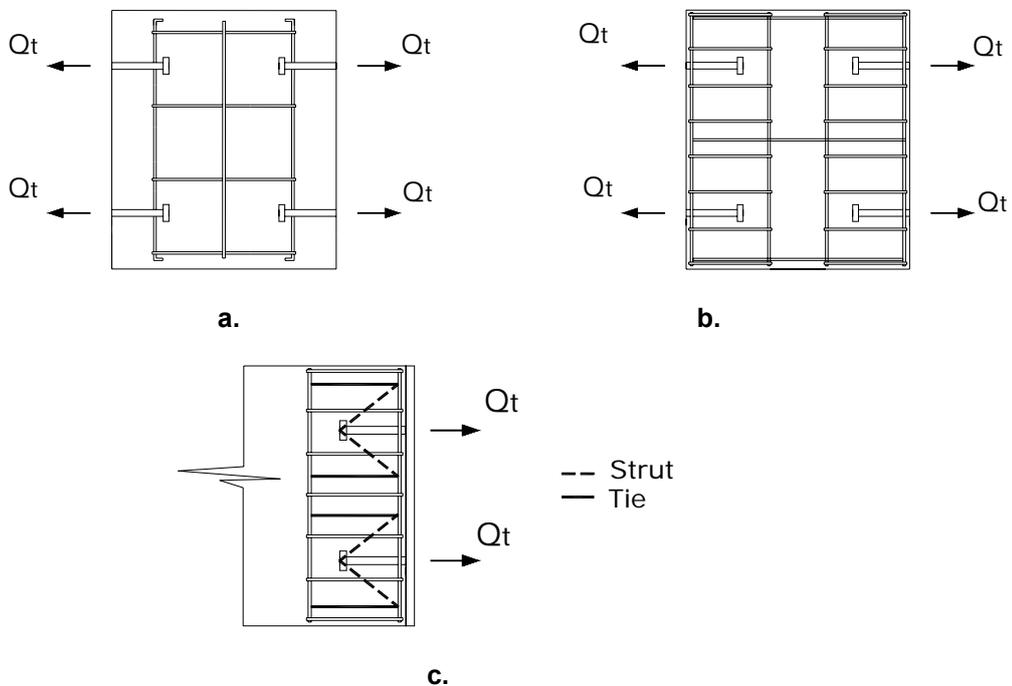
Configuration of reinforcement in tests of Saari et al. (2004). a) Configuration with "perimeter bar". b) Configuration with cage bar. c) Strut-and-tie model developed for Saari's test.
